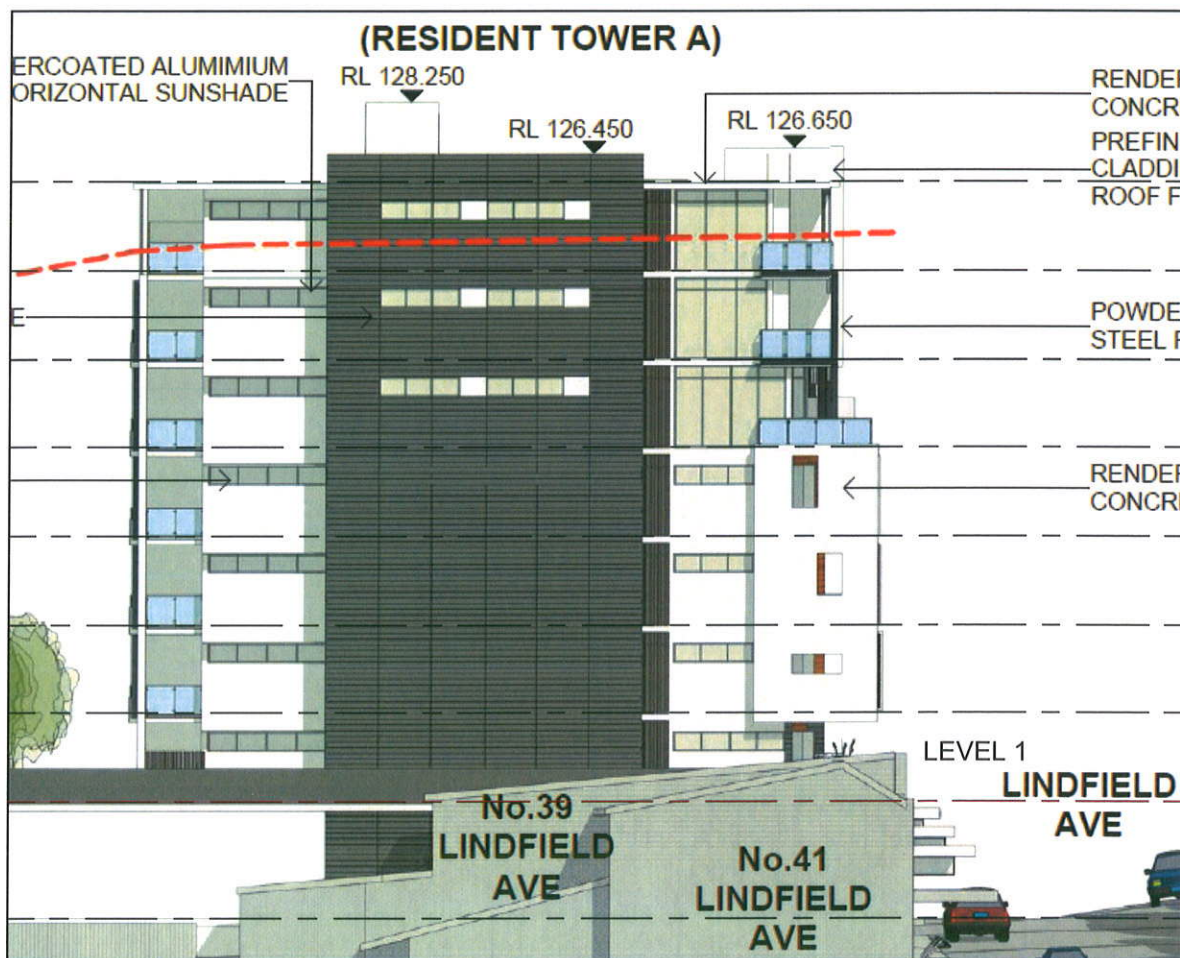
Northern elevation of the Western Tower (Source: Proponent)
